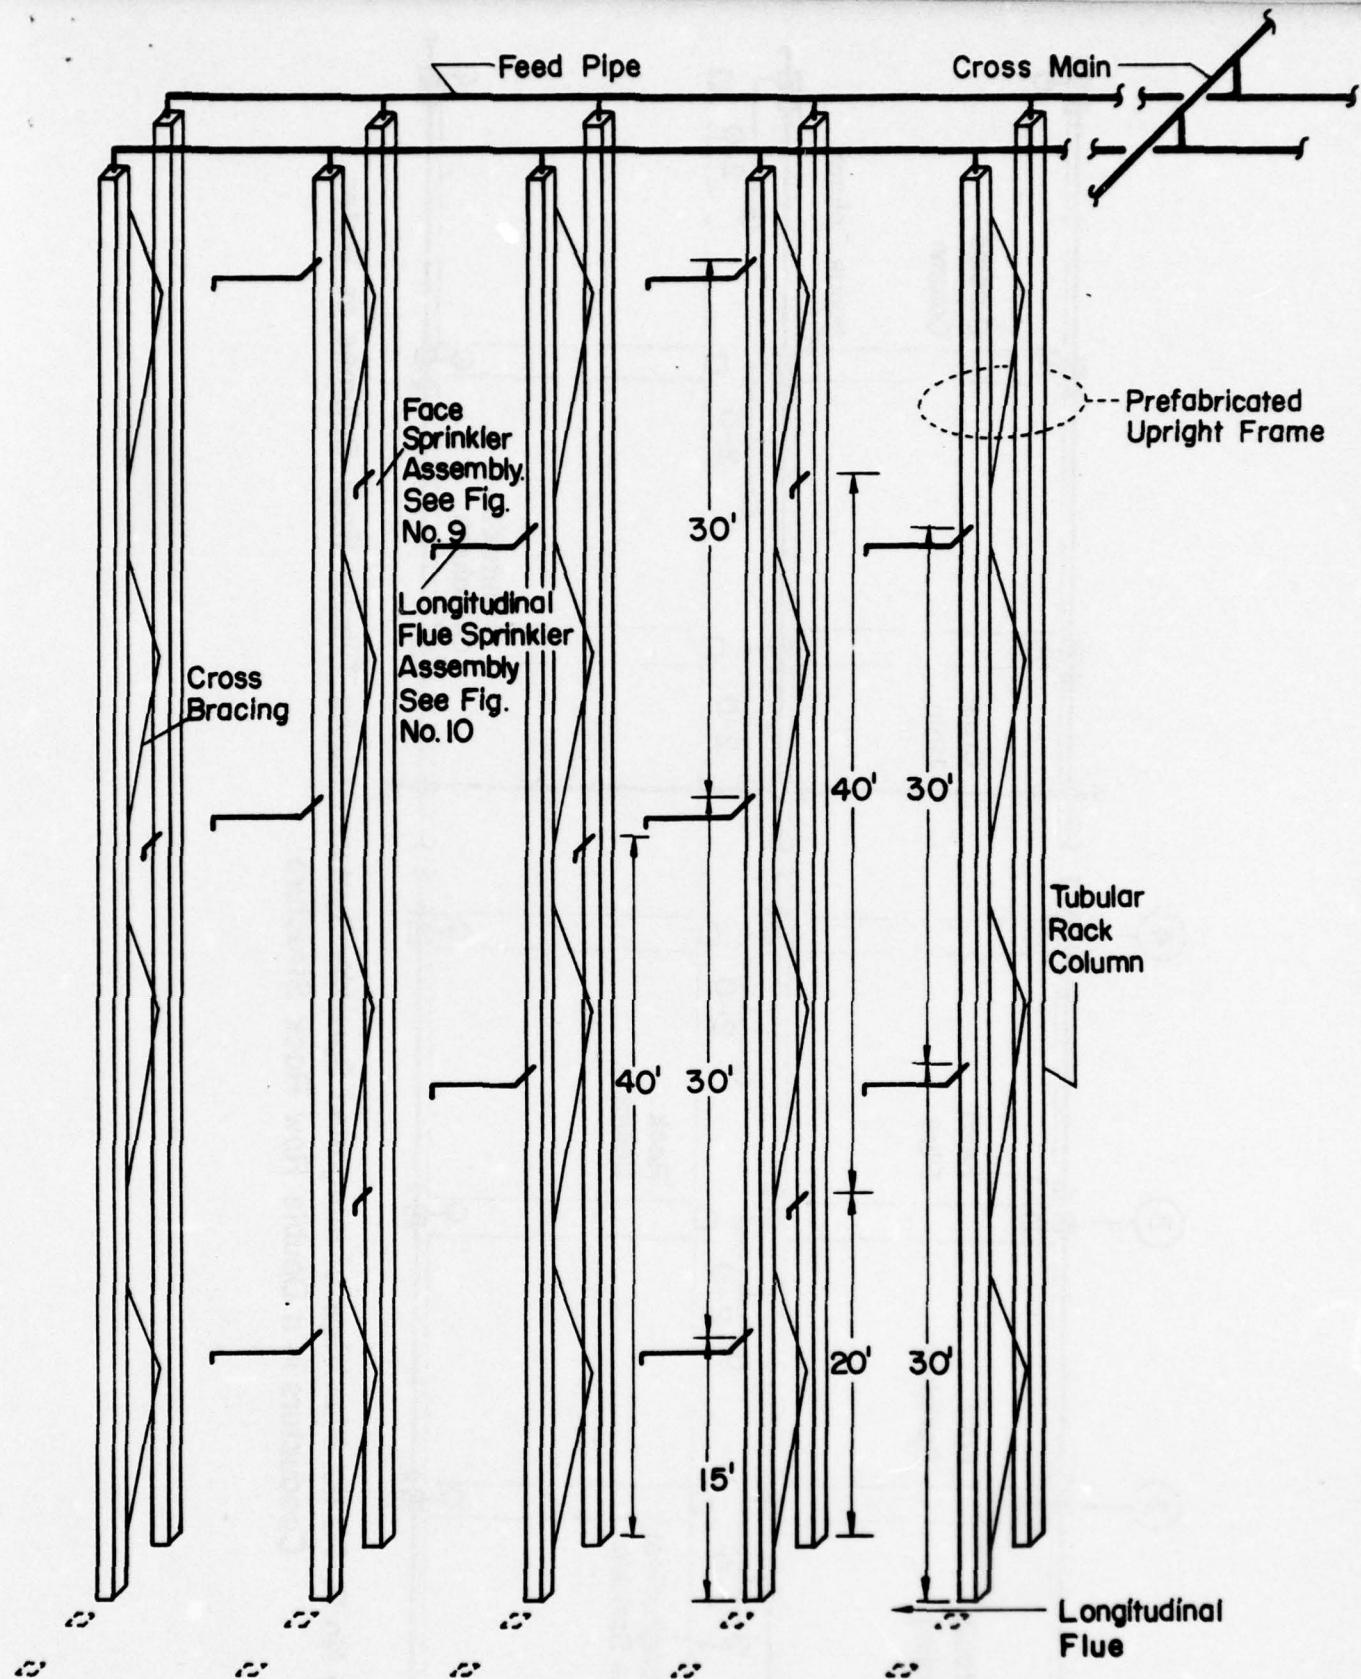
Pictorial Sketch of Integrated Sprinkler System Utilizing Tubular Rack Columns as Water Conductors.
